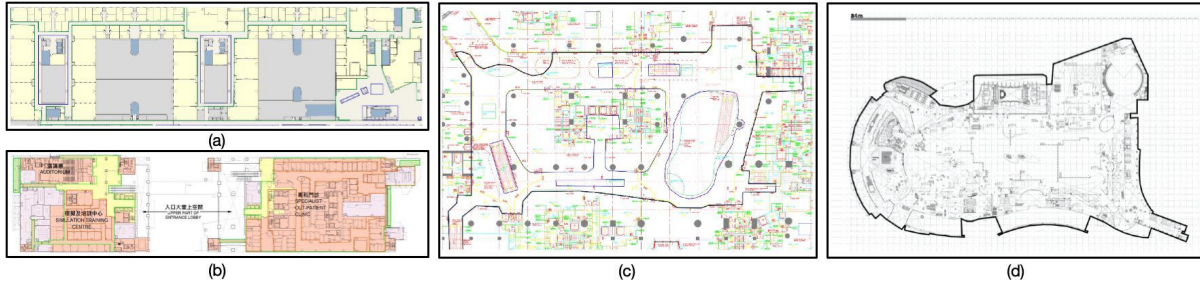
Floor plans of one floor from different sites. (a) Campus. (b) Hospital. (c) Mall A (d) Mall B.
